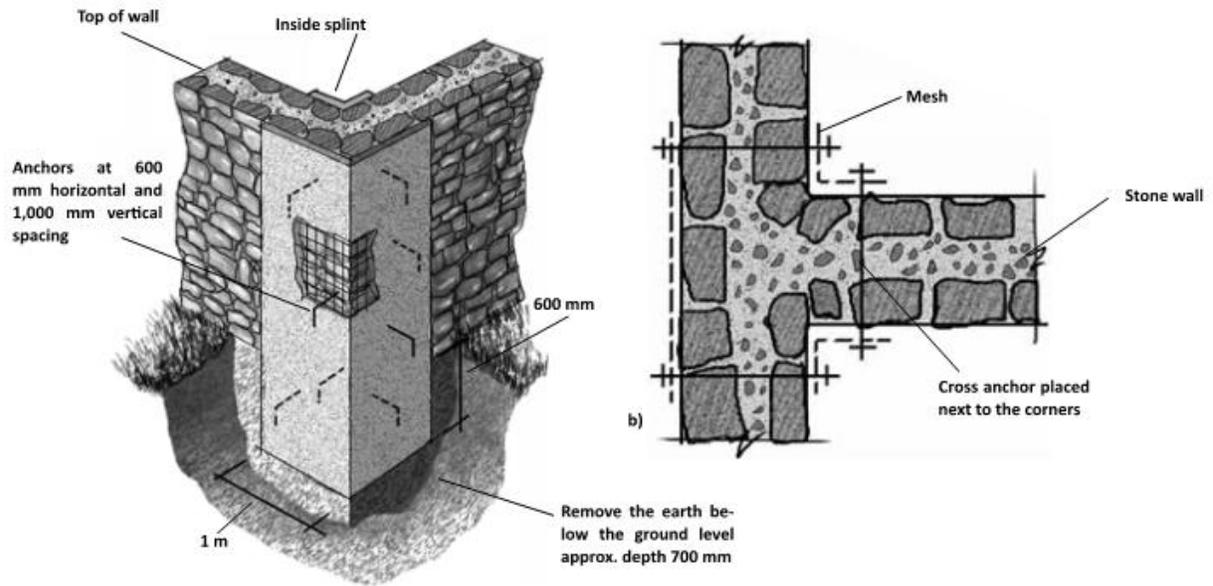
Ferro cement splint to enhance the connections wall-to-wall (Bothara & Brzev, 2011).
